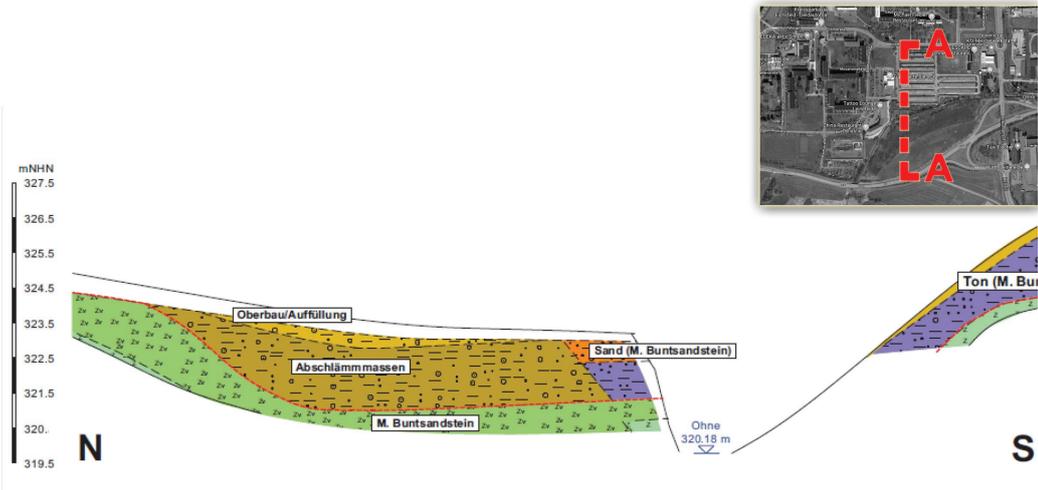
Section A-A of the subsoil layer structure²⁹⁸
